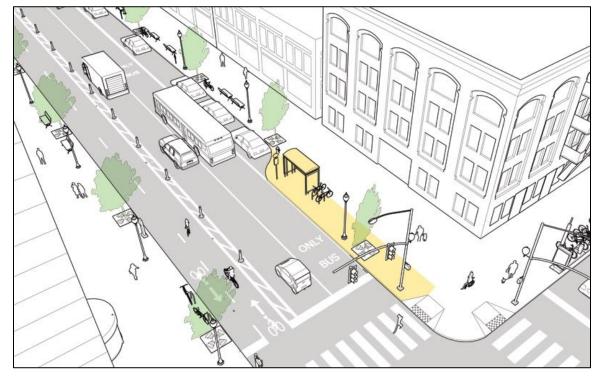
Gateway Treatment's on a wider road using Bulb-outs from NACTO's Urban Street Design Guide
